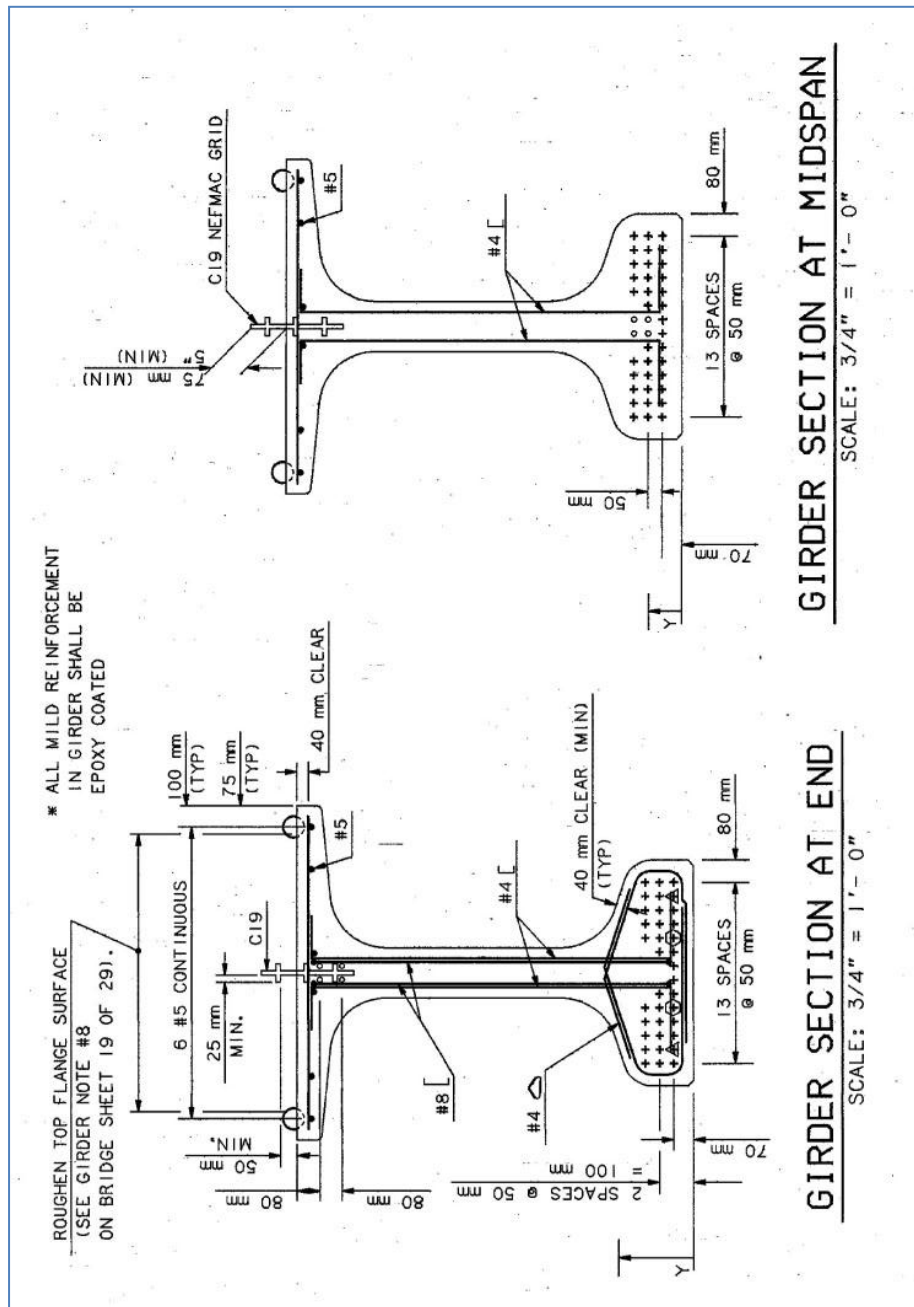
NEBT Section at end and midspan, showing prestressing steel (NHDOT Bureau of Bridge Design, 1999)
